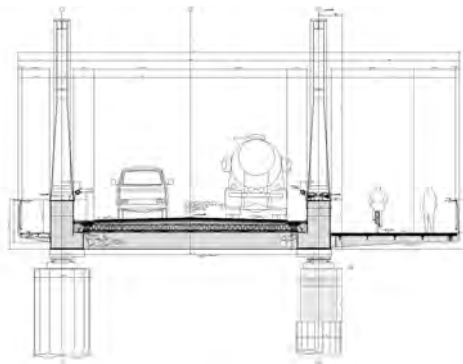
Typical cross-section through fixed part, Temse Bridge, Belgium
